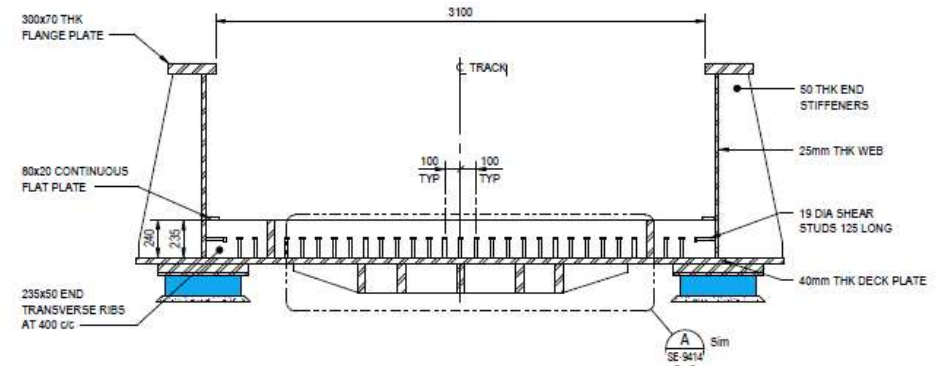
Typical RC Ballast Tray Cross-section from Bridge 194 MSL project
